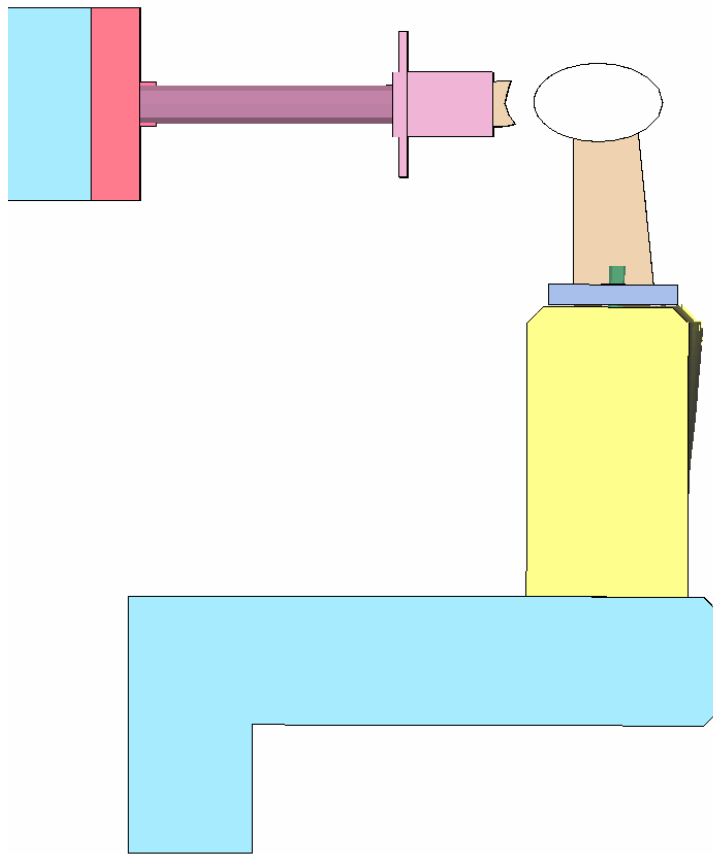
Profile of damaged T4 bridge rail system with four-bolt anchorage after pendulum impact.
